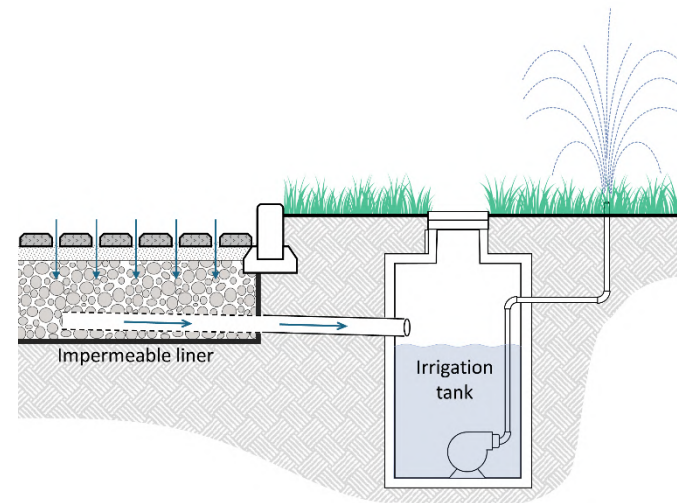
Schematic of pervious pavement for stormwater harvesting (By Author)
